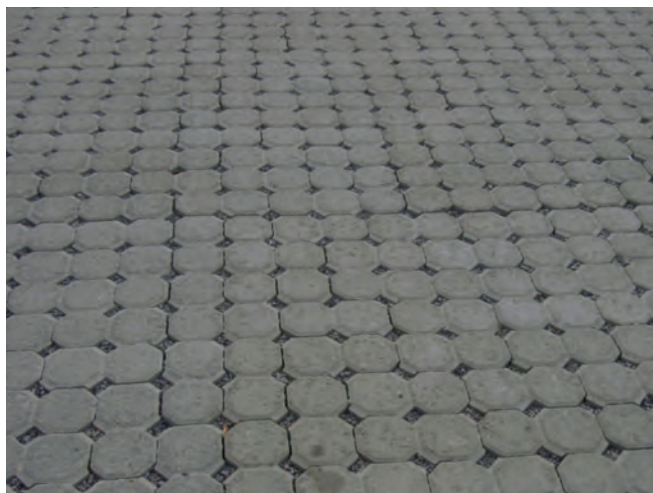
Permeable interlocking concrete paver blocks make an aesthetically pleasing, well-drained pavement for low-volume streets and parking lots (photo courtesy of Interlocking Concrete Pavement Institute)
